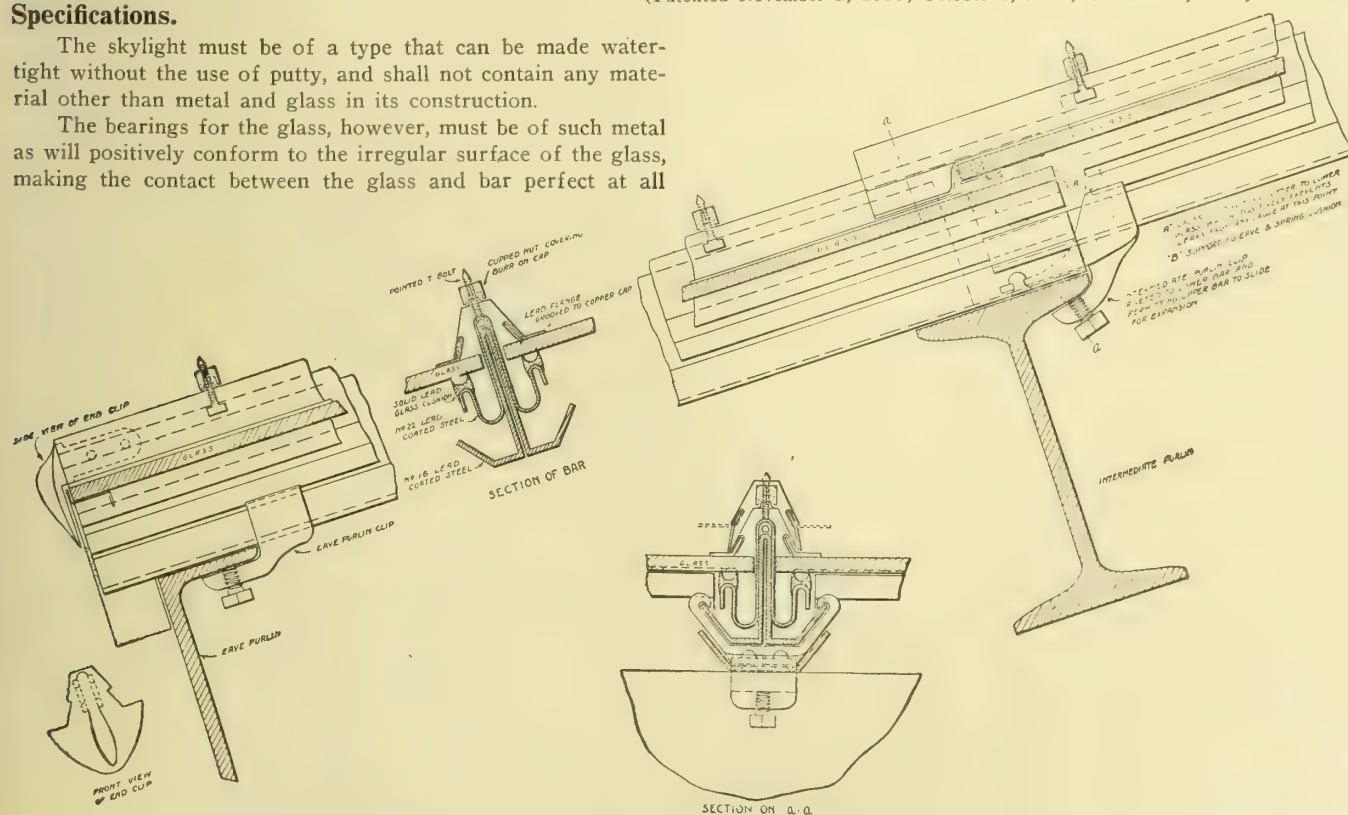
COMPLETE BAR ASSEMBLY, SHOWING THE GLASS AND DETAILS OF CONSTRUCTION
